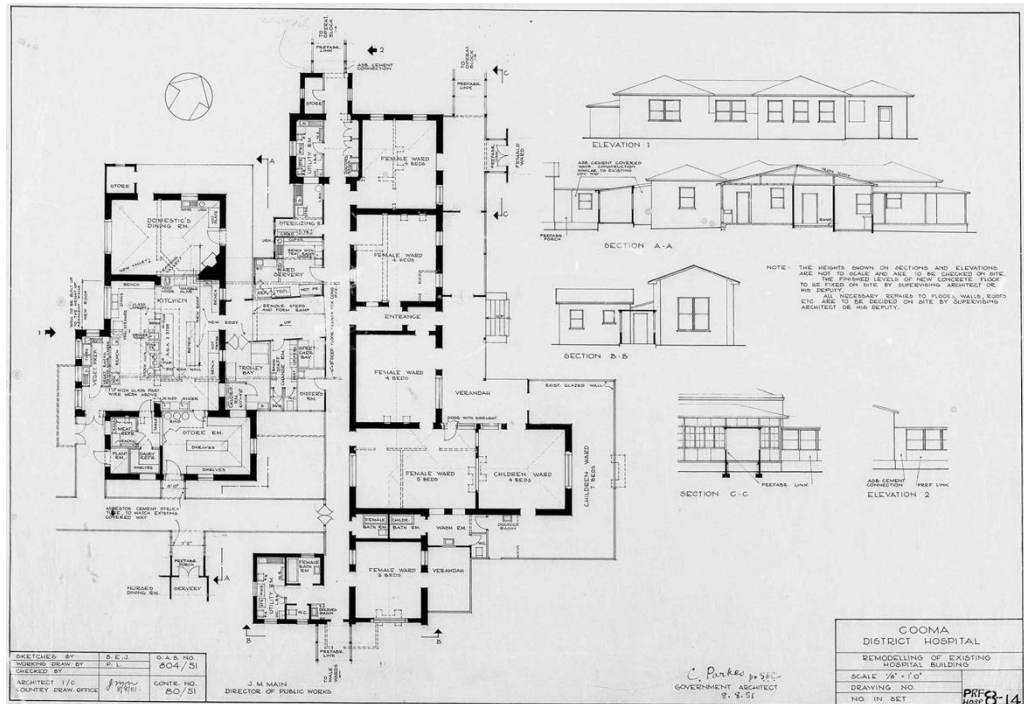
Plan for "remodelling of existing hospital building", signed by Government Architect Cobden Parkes on 8 August 1951, showing planned alterations to the hospital. These were likely not carried out as shown, but show the planned prefabricated links to new buildings, including the new 'female ward' in front of the old hospital building. (Source: NSW Plan Services (PWA), PRF-PH8-14 – Cooma Hospital – Existing Building Remodelling – Floor Plan – Elevations & Sections)
